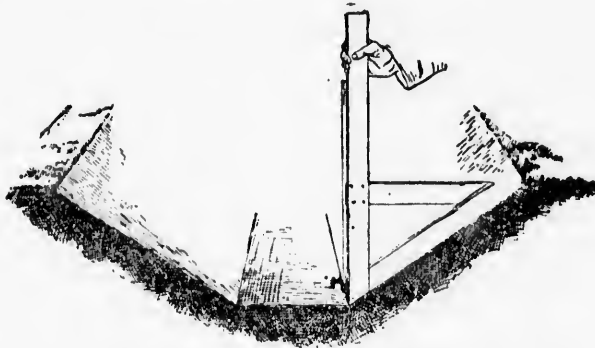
SHOWING HOW THE DITCH GAUGE IS USED.
